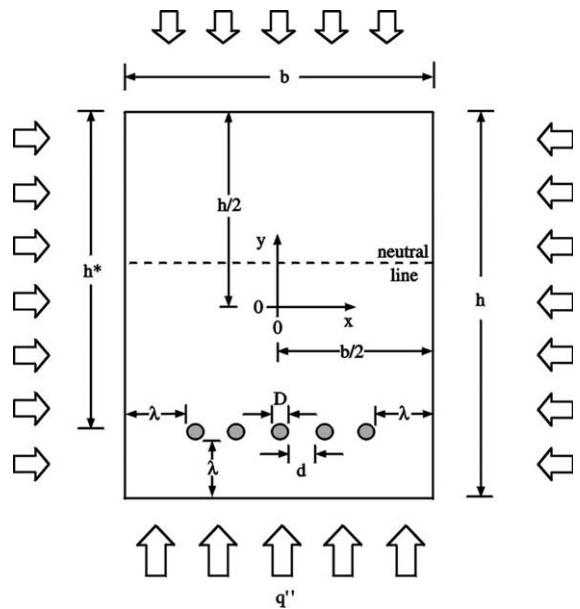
The cross-section of a beam of concrete reinforced with round steel bars and heated suddenly on all sides.
